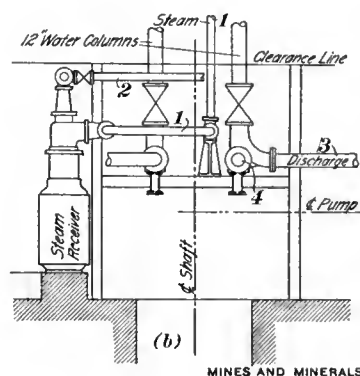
PLAN OF PIPE ARRANGEMENT, 1200-FOOT LEVEL
